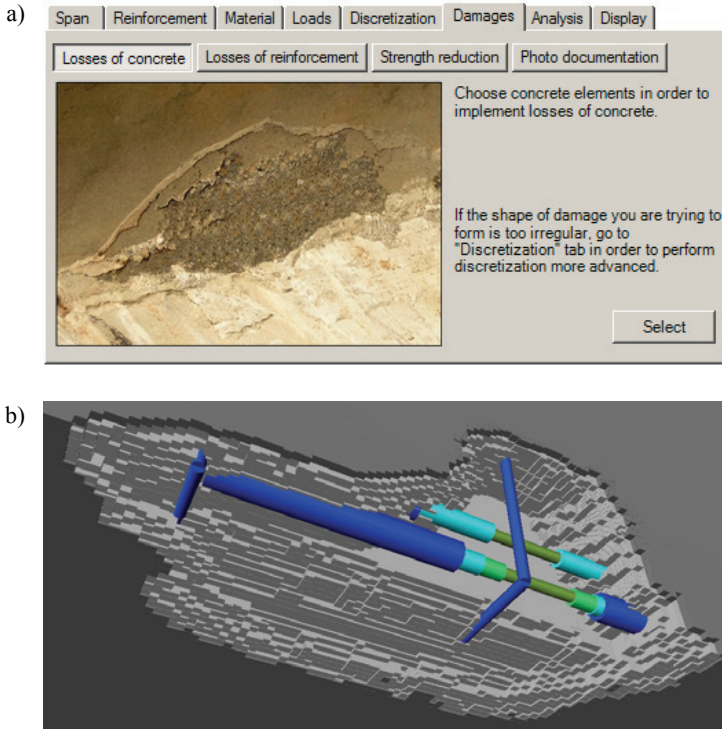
Modelling of concrete losses: a) documentation of bridge inspection, b) combination of concrete and reinforcement losses visualised by means of DAGA system
